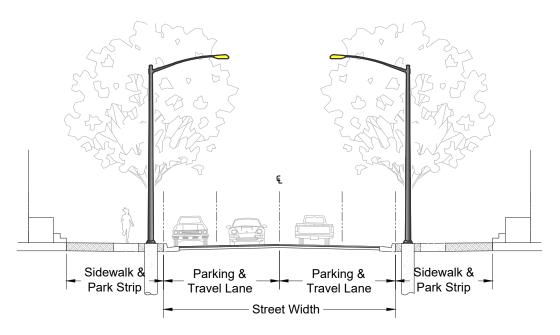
Typical Local Street with Non-Continuous Street Lighting Cross Section
